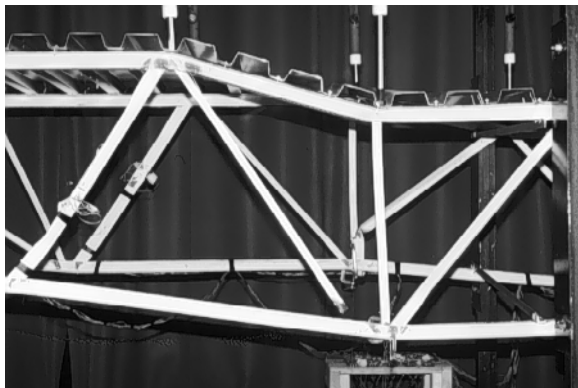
Failure Mode for 26K5-DX-1 West Joist
